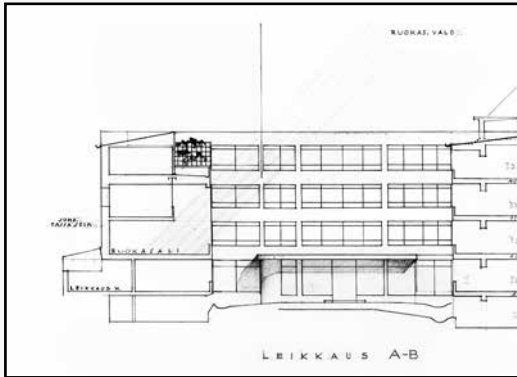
The solution of the suspended intermediate floor in the dining hall was already included in the design at the competition stage. The top floor housed apartments and a terrace. The wire was fixed to the beams of the floor between the first and second floors. Medical experts criticised the solution for its costs and the difficult air flow. In the master drawing, the wire is fixed to the third floor beam. Detail of drawing No. 50-29. The drawing has been edited. AAM.
